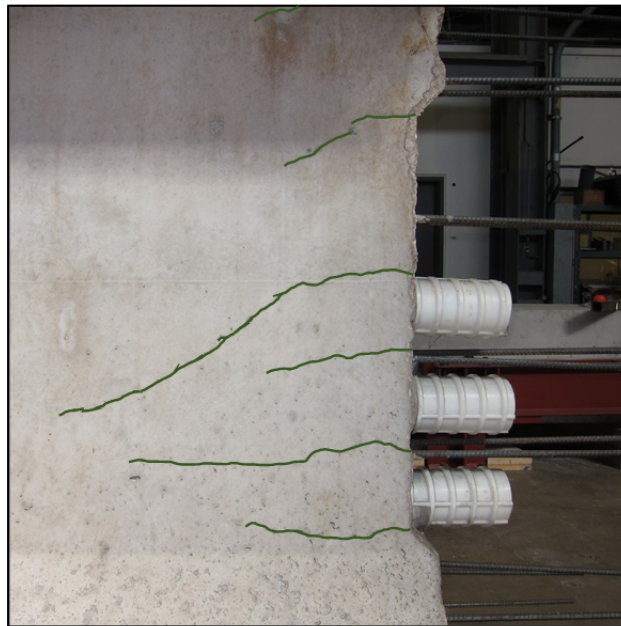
End-region cracking – short precast segment of Test Girder 1
